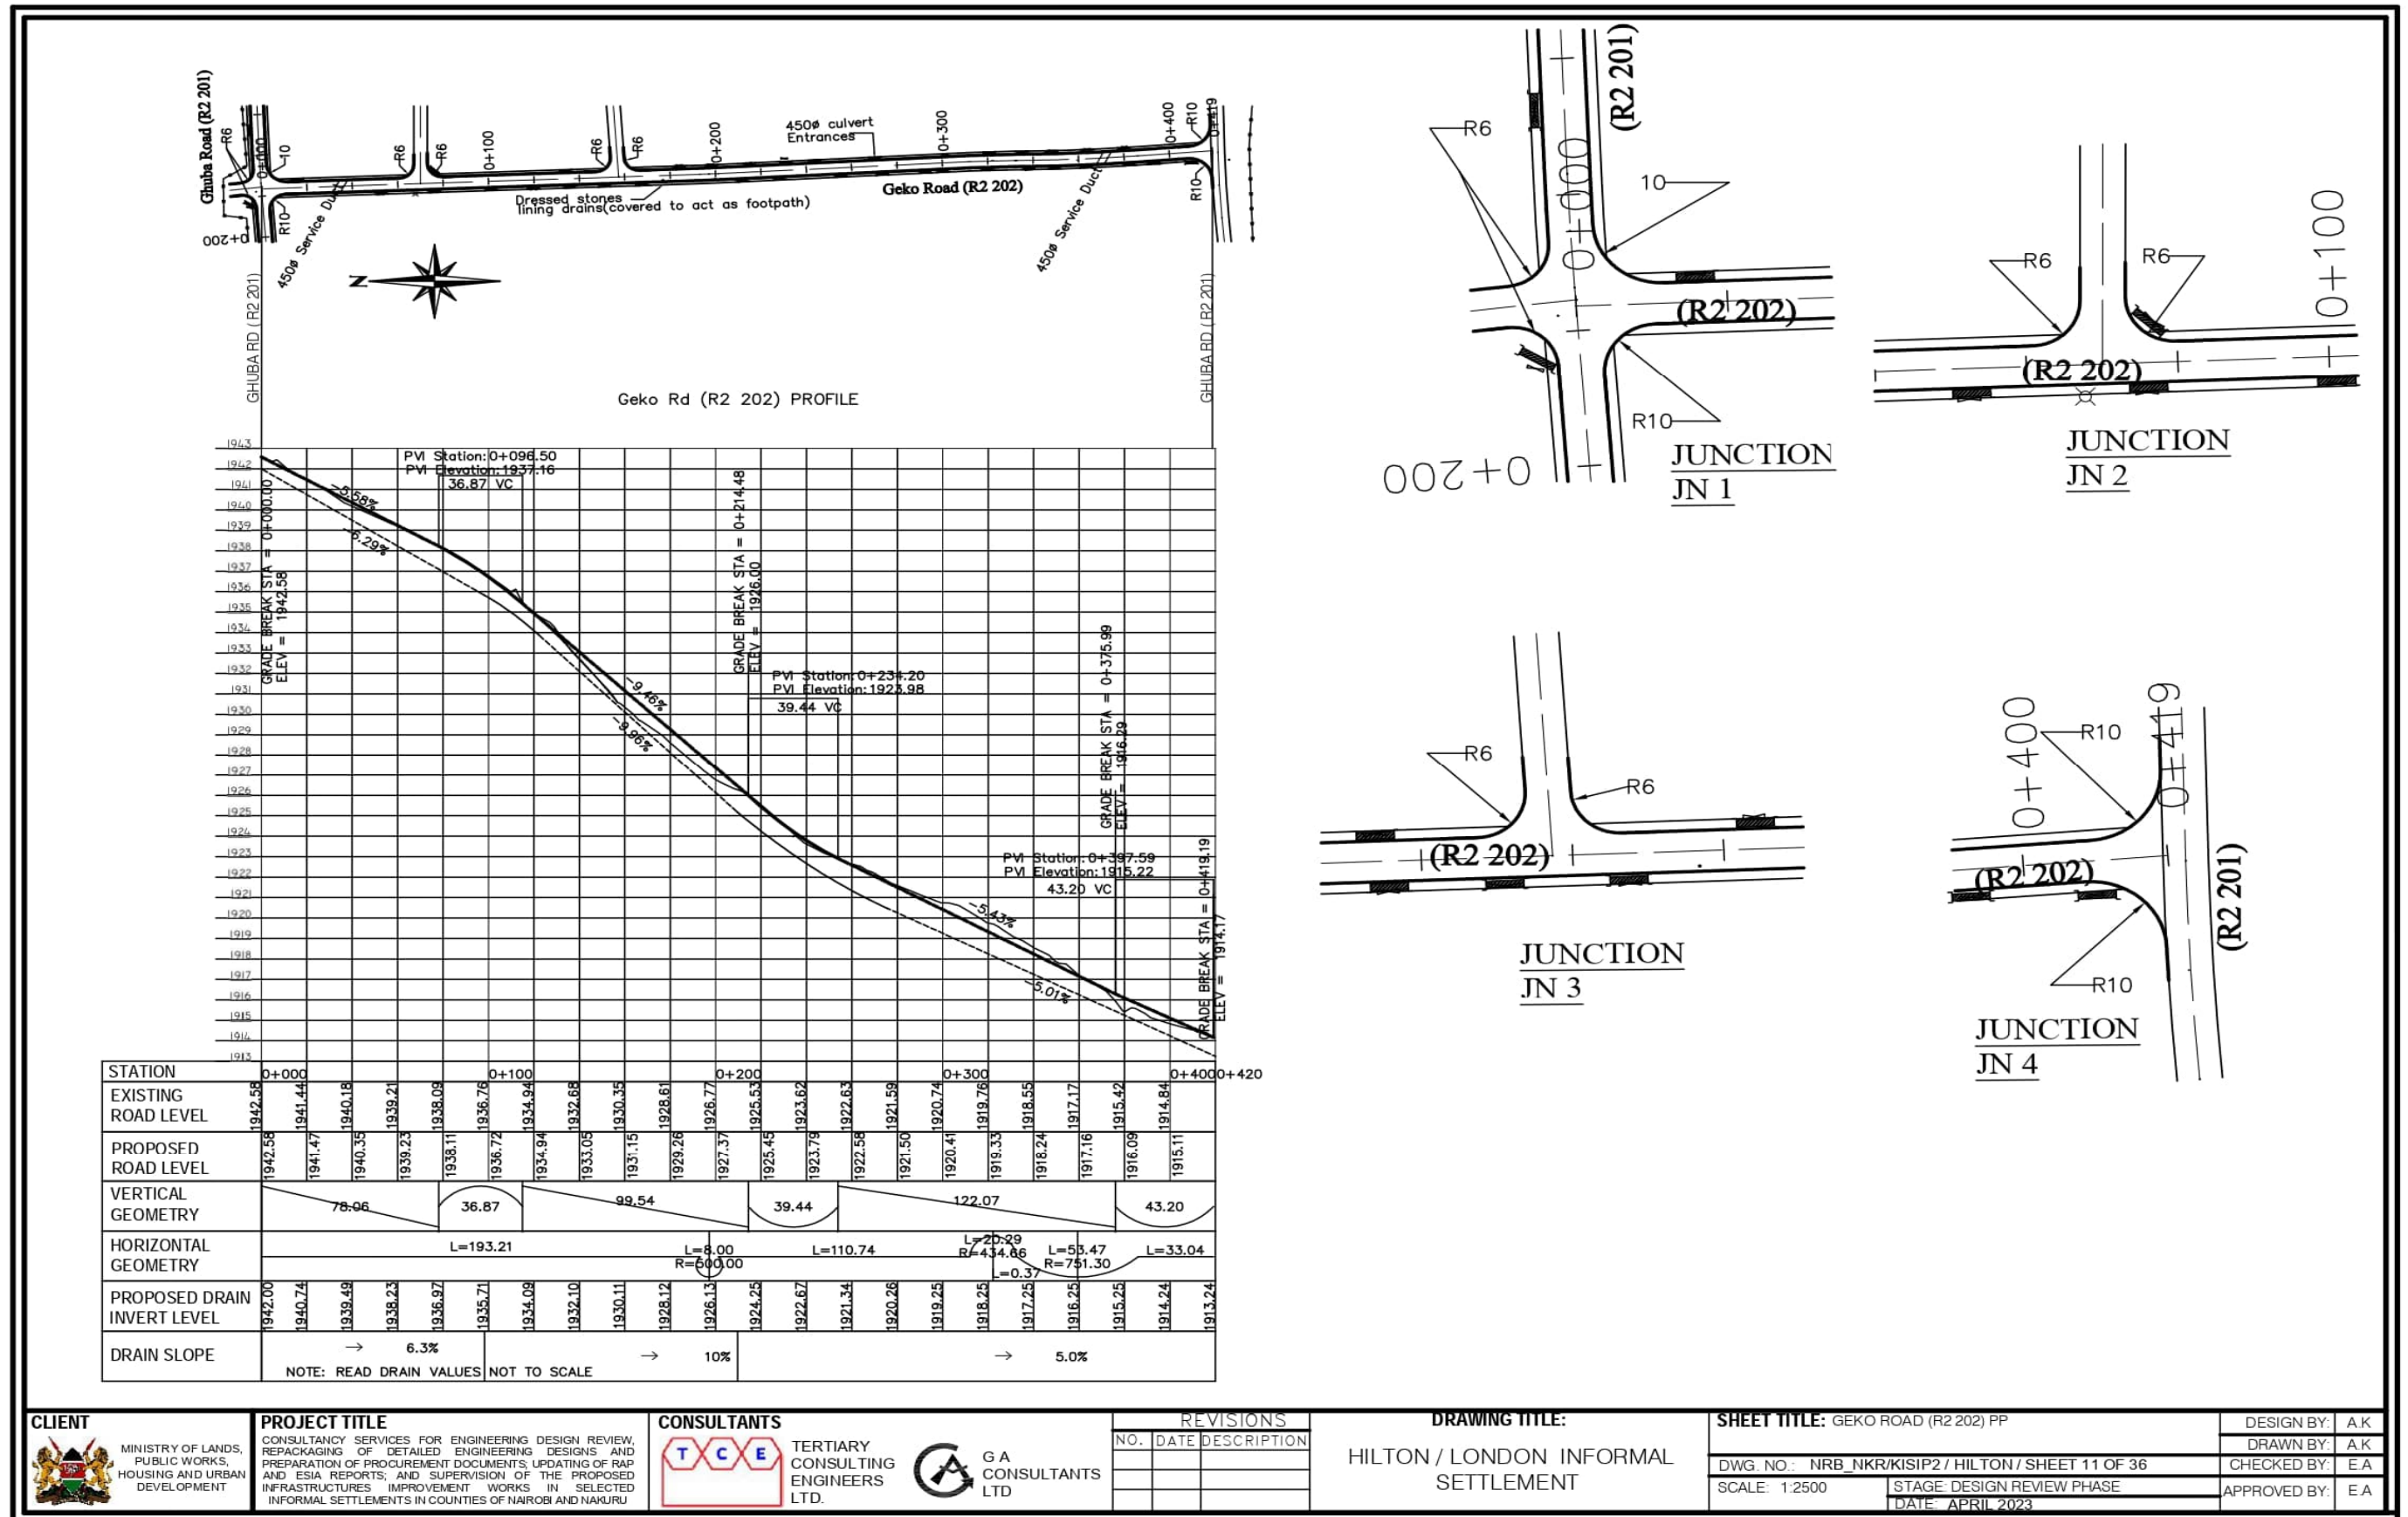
London/Hilton – Giko Road Plan and Profile
